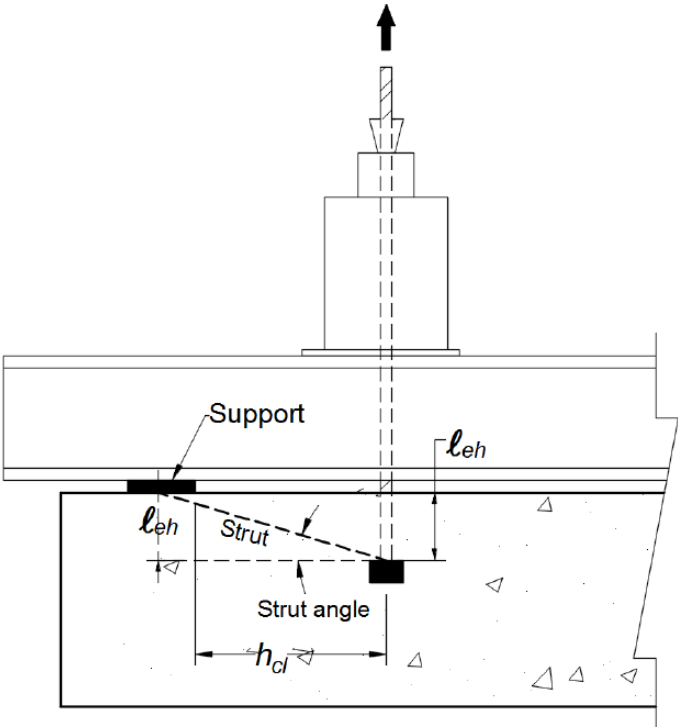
Strut angle between anchored headed bar and nearest support reaction
